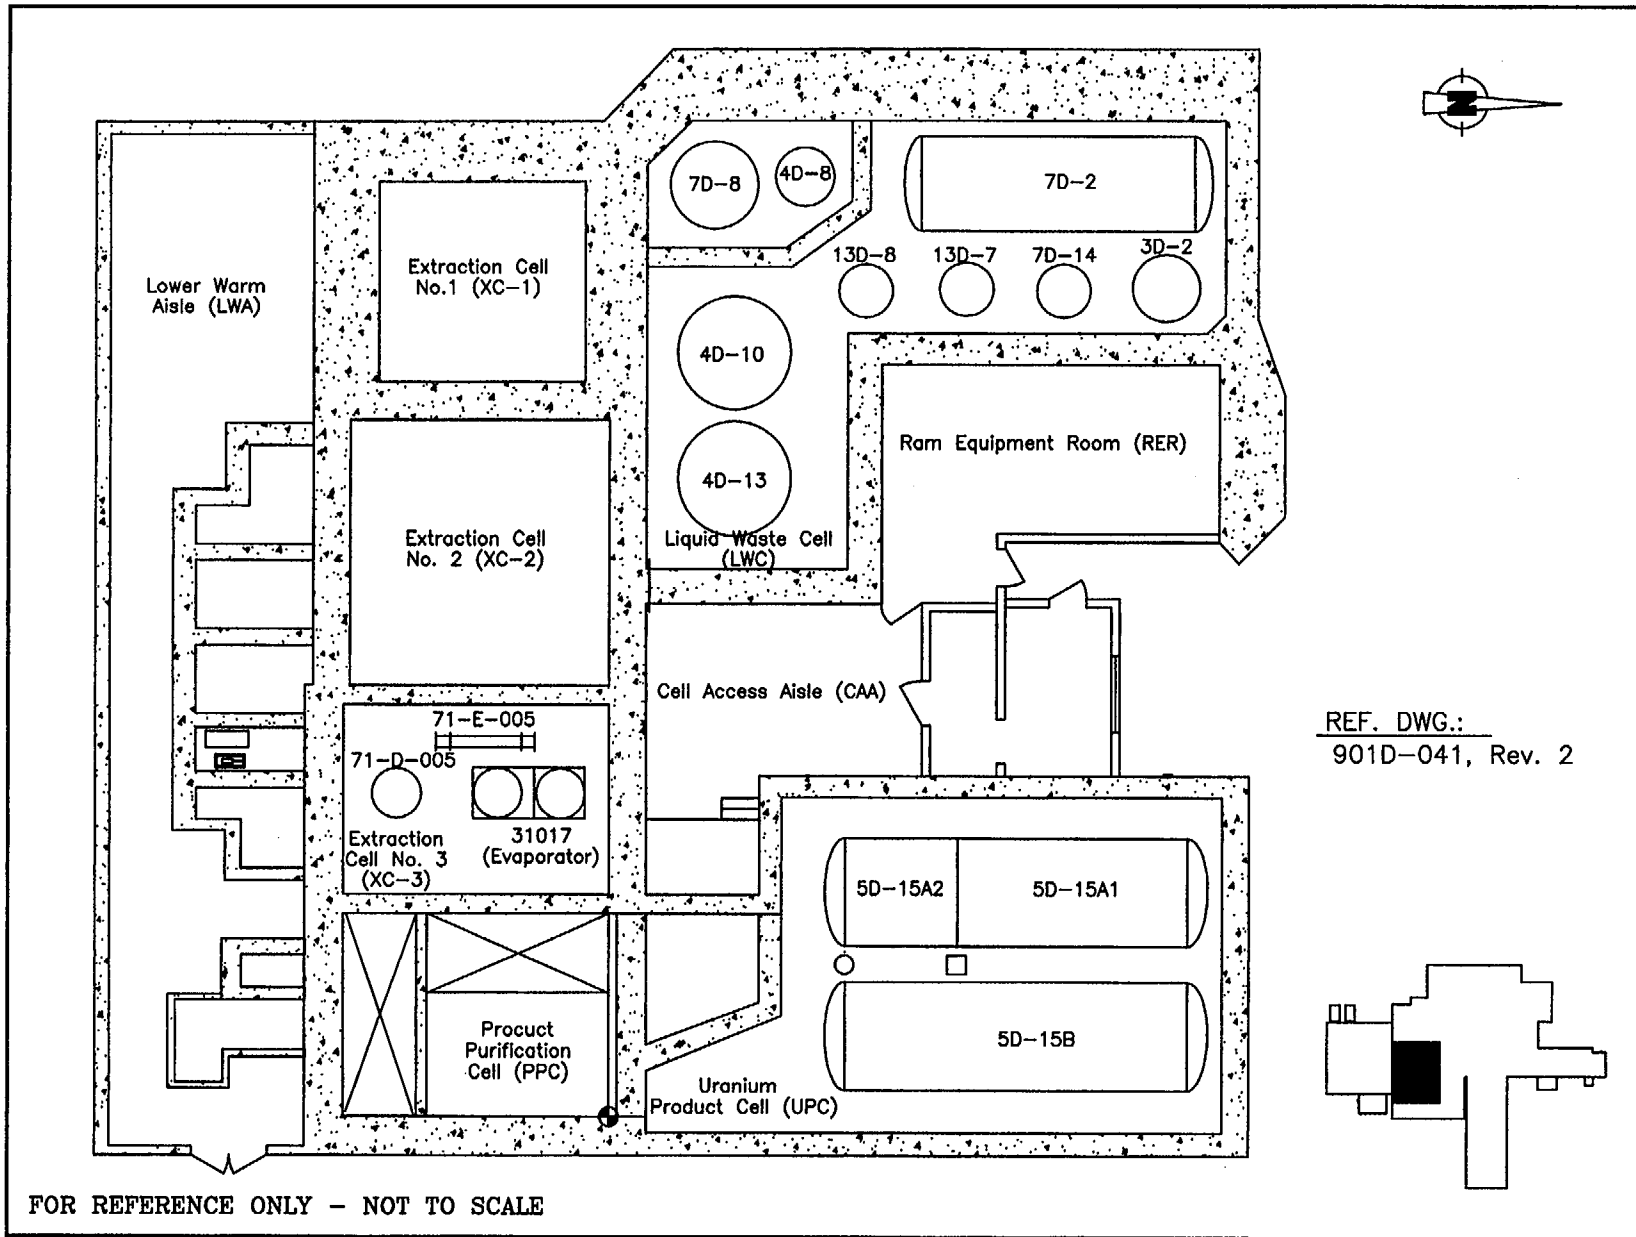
Equipment Arrangement – Liquid Waste Cell Plan
